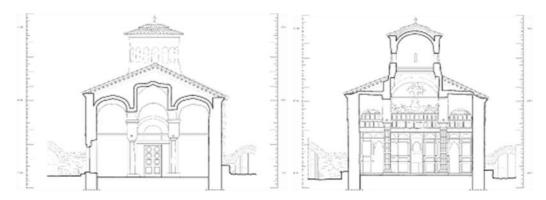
Section B-B - Transversal (left), section C-C - Transversal (right)
